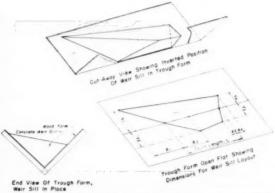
Details of right-angle trough form for casting concrete sills. Values of the layout for an 8-ft culvert width are shown in Table 1
